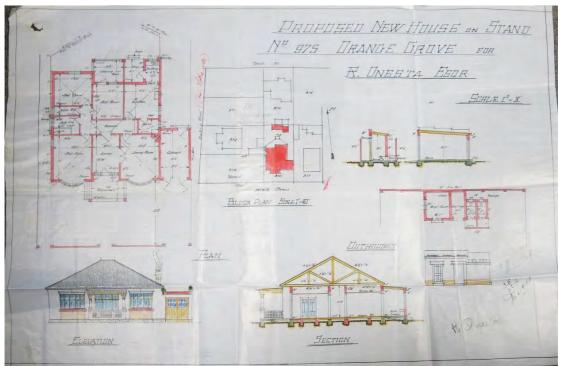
Plan for proposed new house on Stand 975, Orange Grove One Stand away from Louis Botha Avenue (Source: City Council of Johannesburg, Plans Archive)
